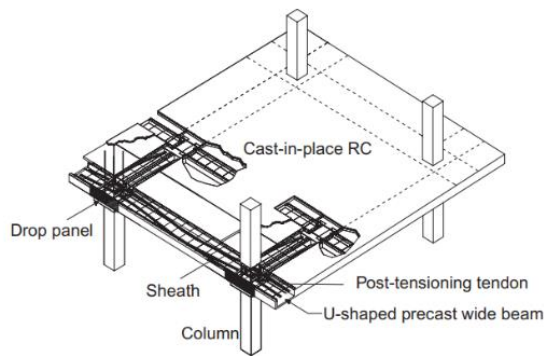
Precast U-Shell Beam Application in Building Construction [8]
